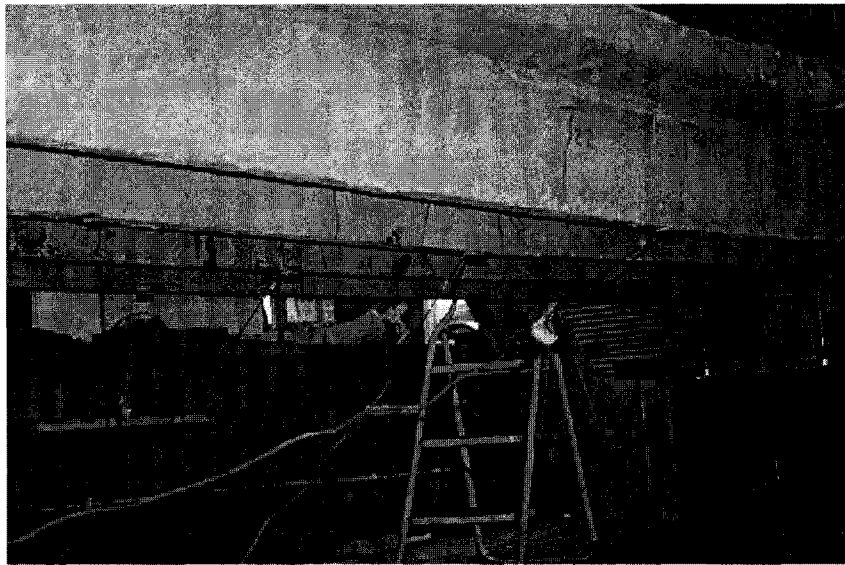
Cracking of Composite Joint Connection Prior to Ultimate Load
